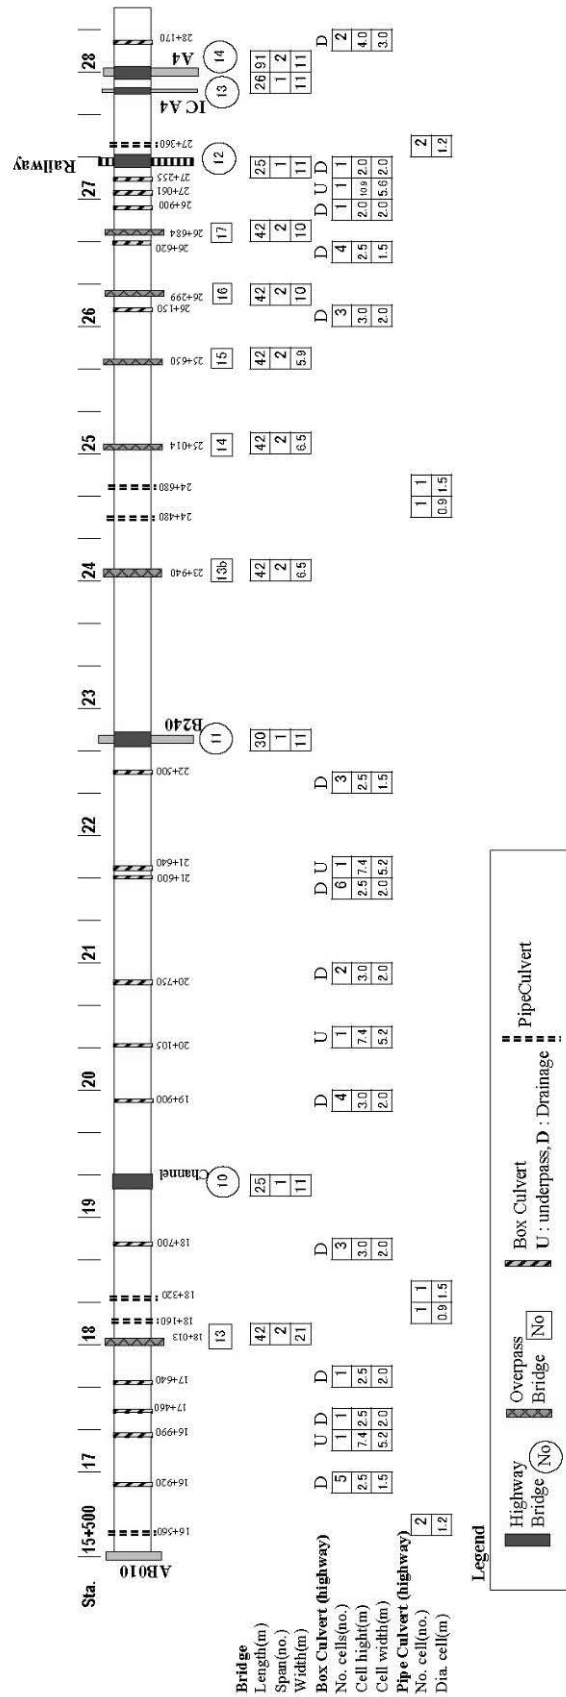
Layout of Structures of Package 3 (Detail design section)
